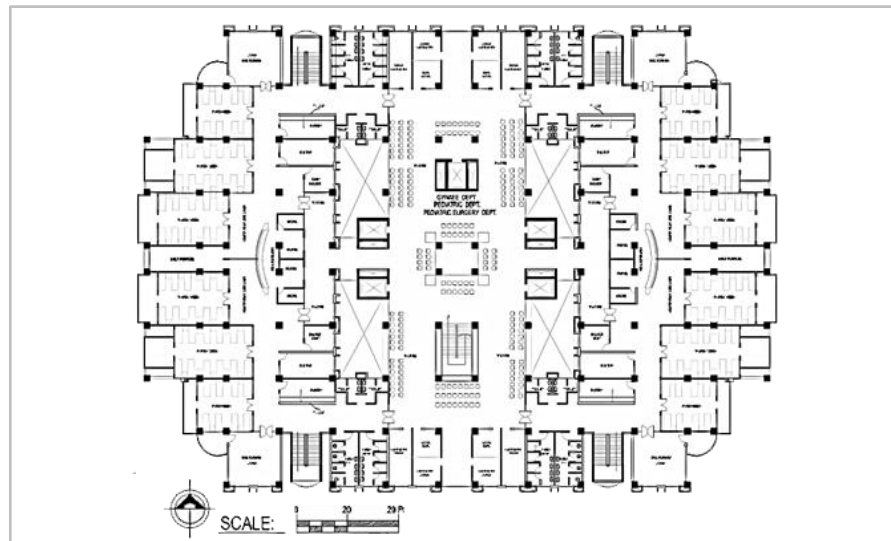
Typical floor plan Hospital H (In-patient wards)
